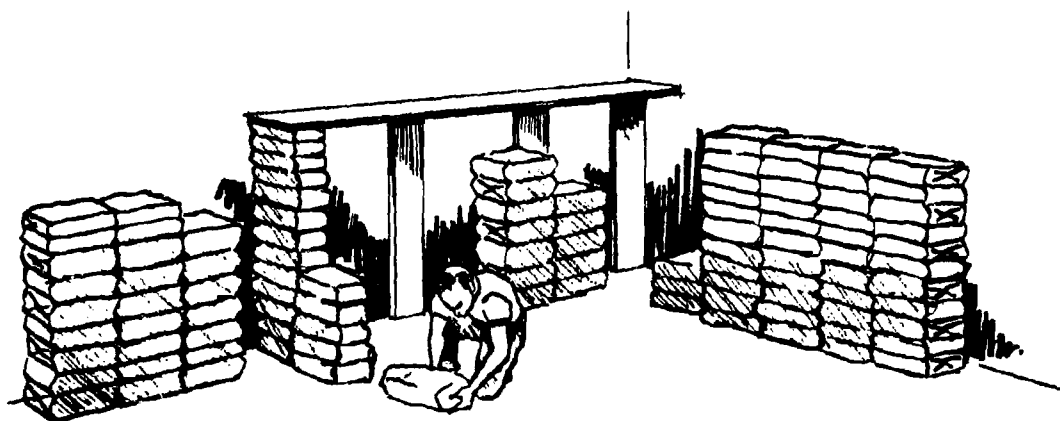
First Wall of Improvised Sandbag Shelter in the Process of Construction
